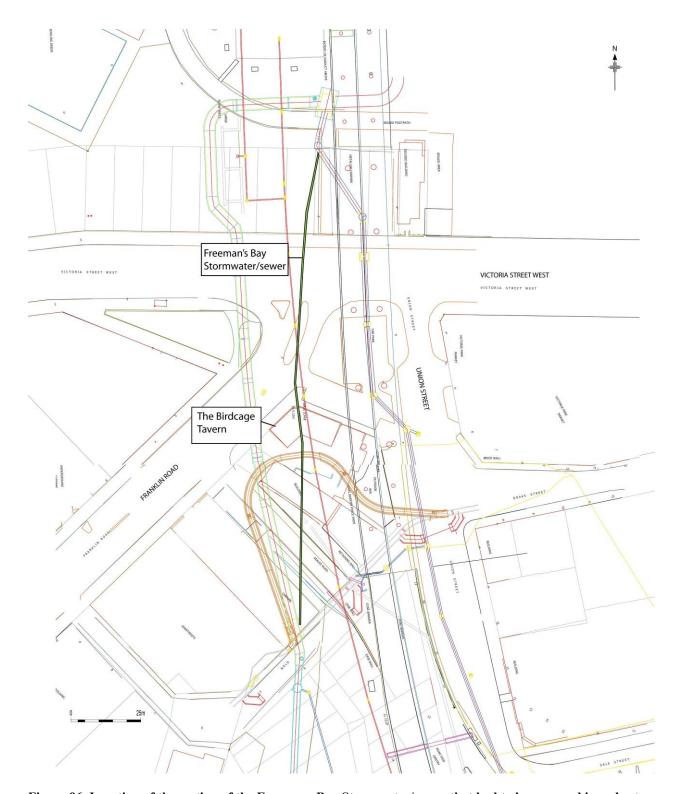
Location of the section of the Freemans Bay Stormwater/sewer that had to be removed in order to construct the tunnel
